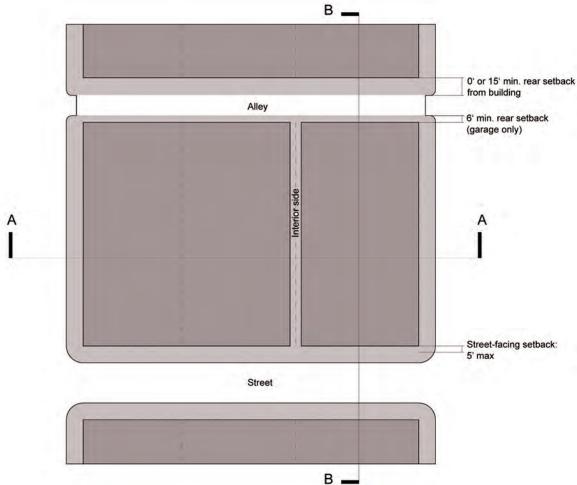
Mixed Use Area Buildings with Storefront Plan diagram
